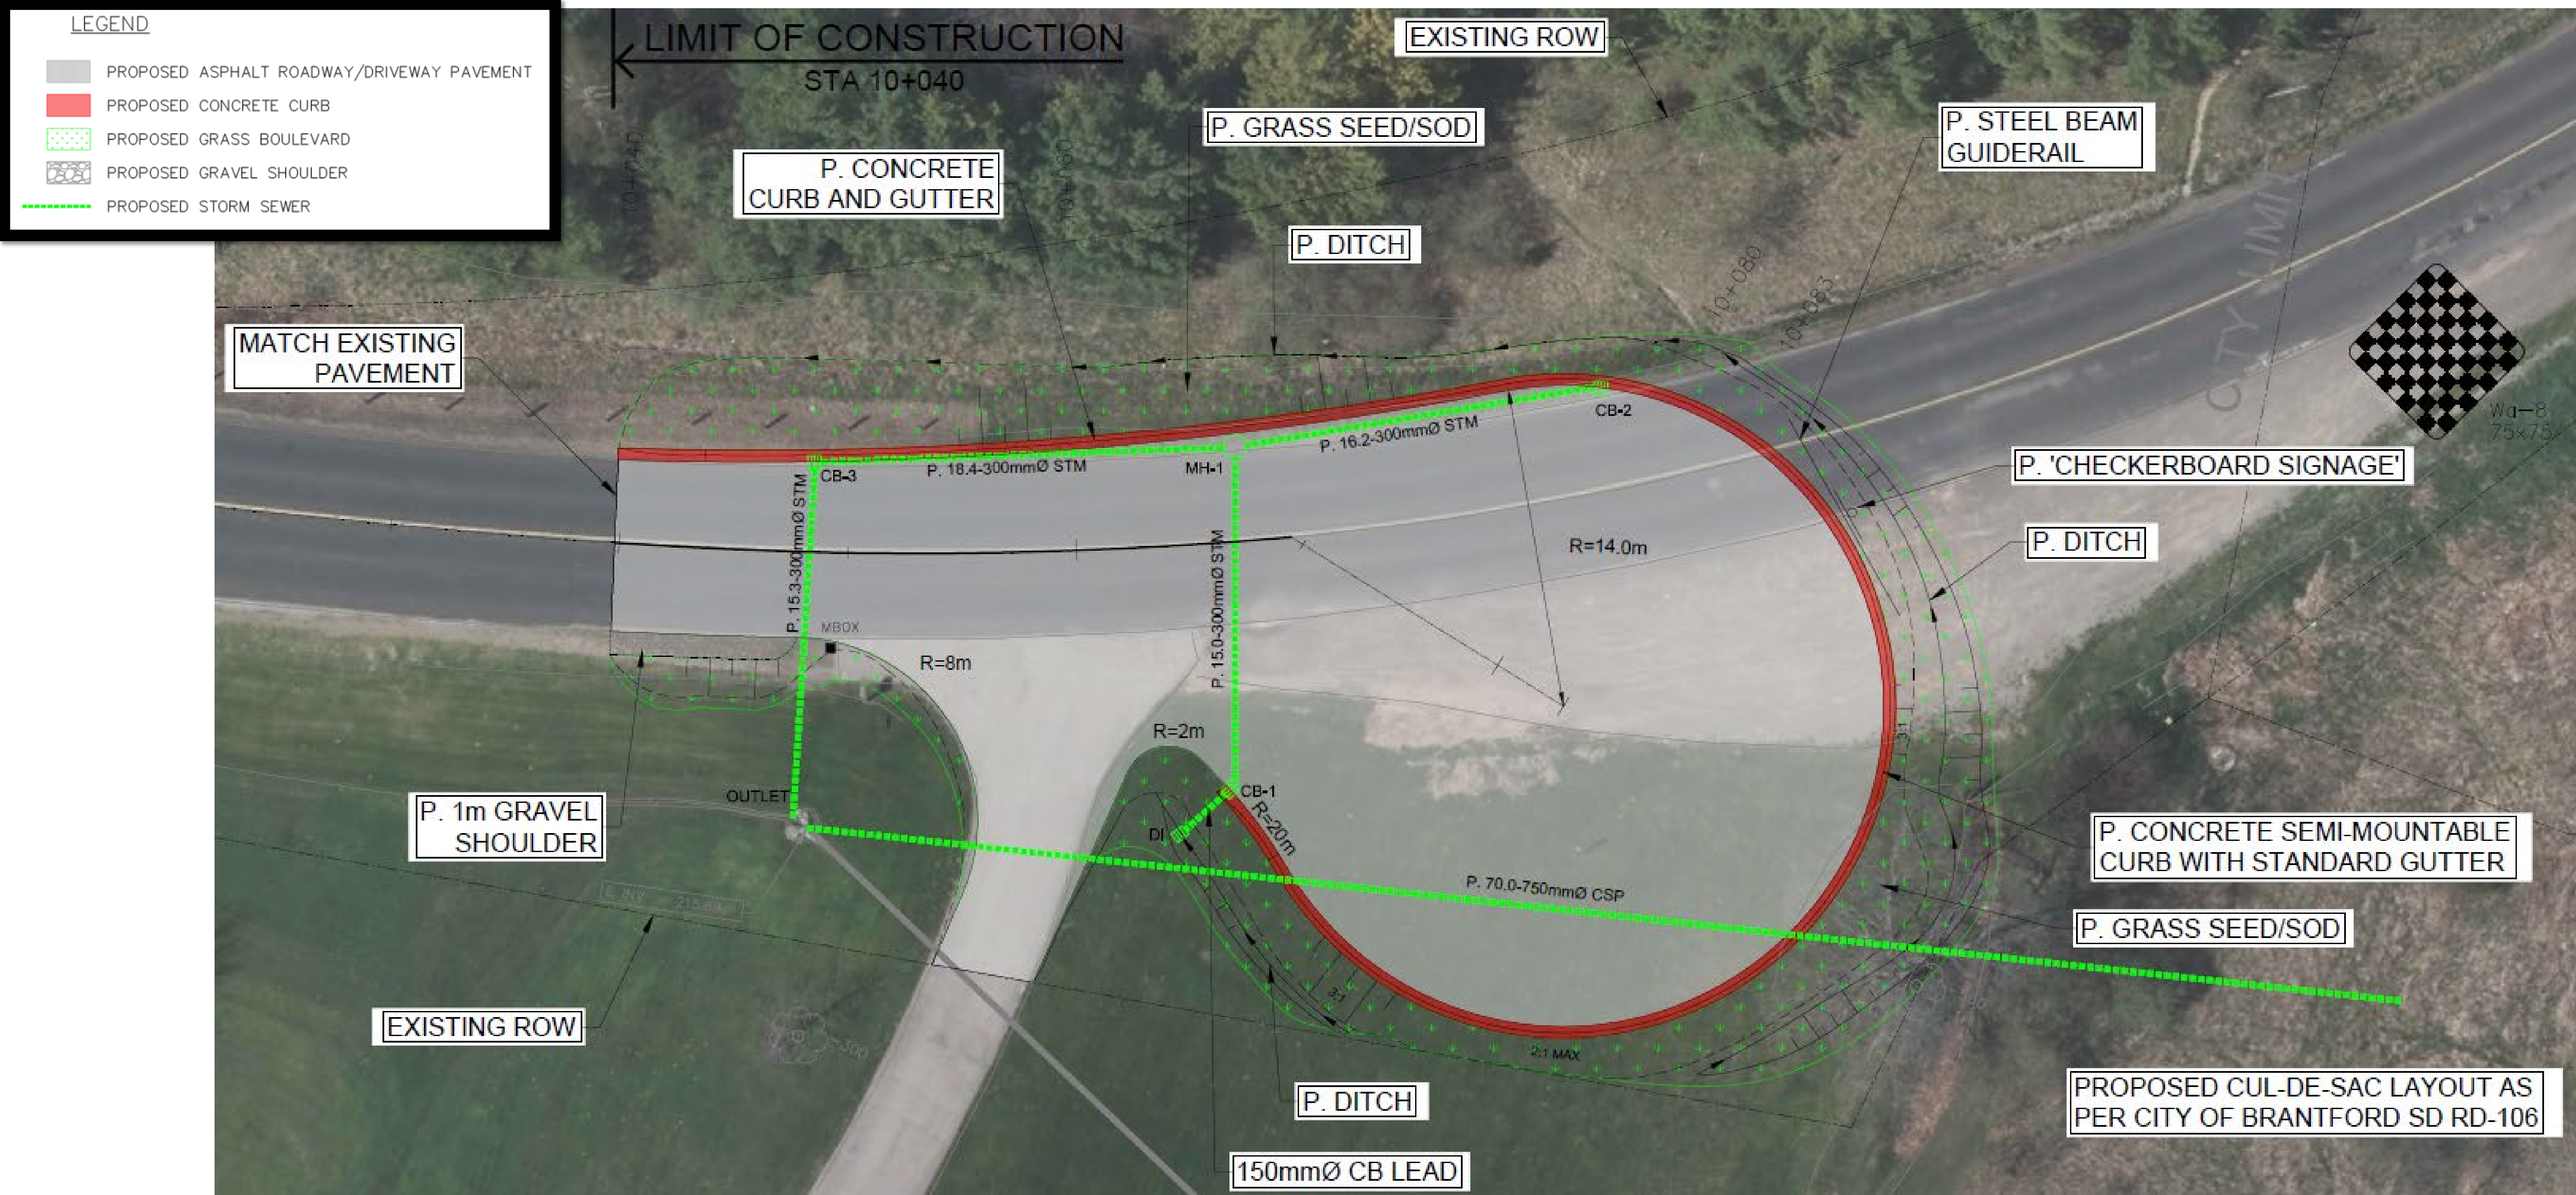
Proposed Cul-de-sac Design (Plan View)
